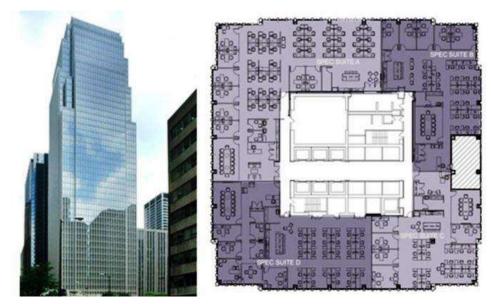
West Madison Street 181, (left), Characteristic Floor Plan (right) [9,10]
